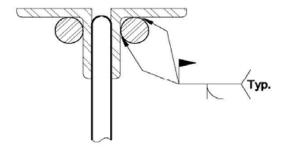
Top Chord Reinforcement (Rods) (Fisher, 2004)
